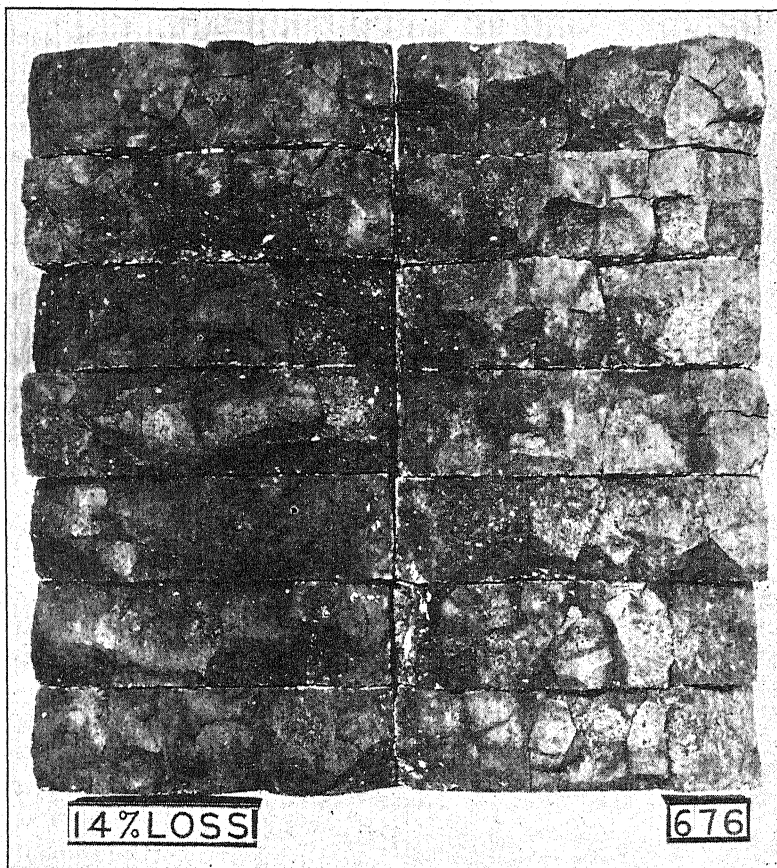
Photograph Showing Manner in Which Test Brick Are to Be Arranged for Making Photographic Report.
